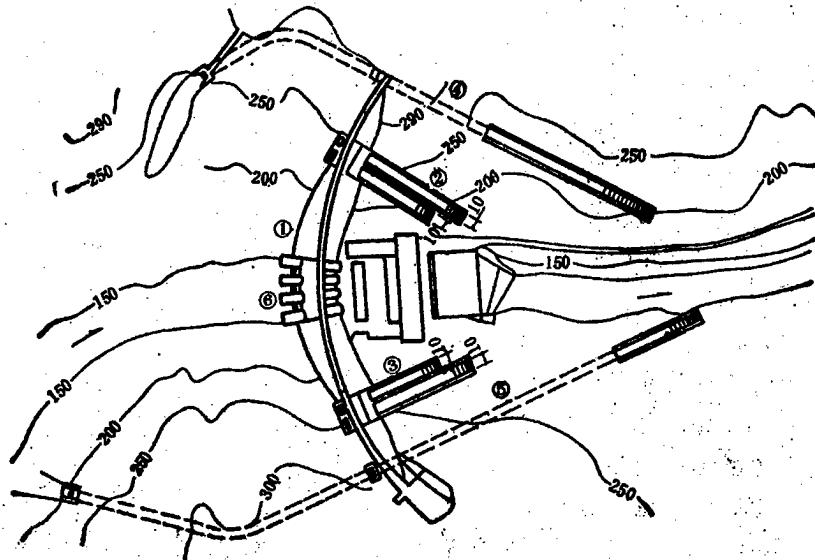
Schematic of Dongjiang Hydropower Station Structural Layout
